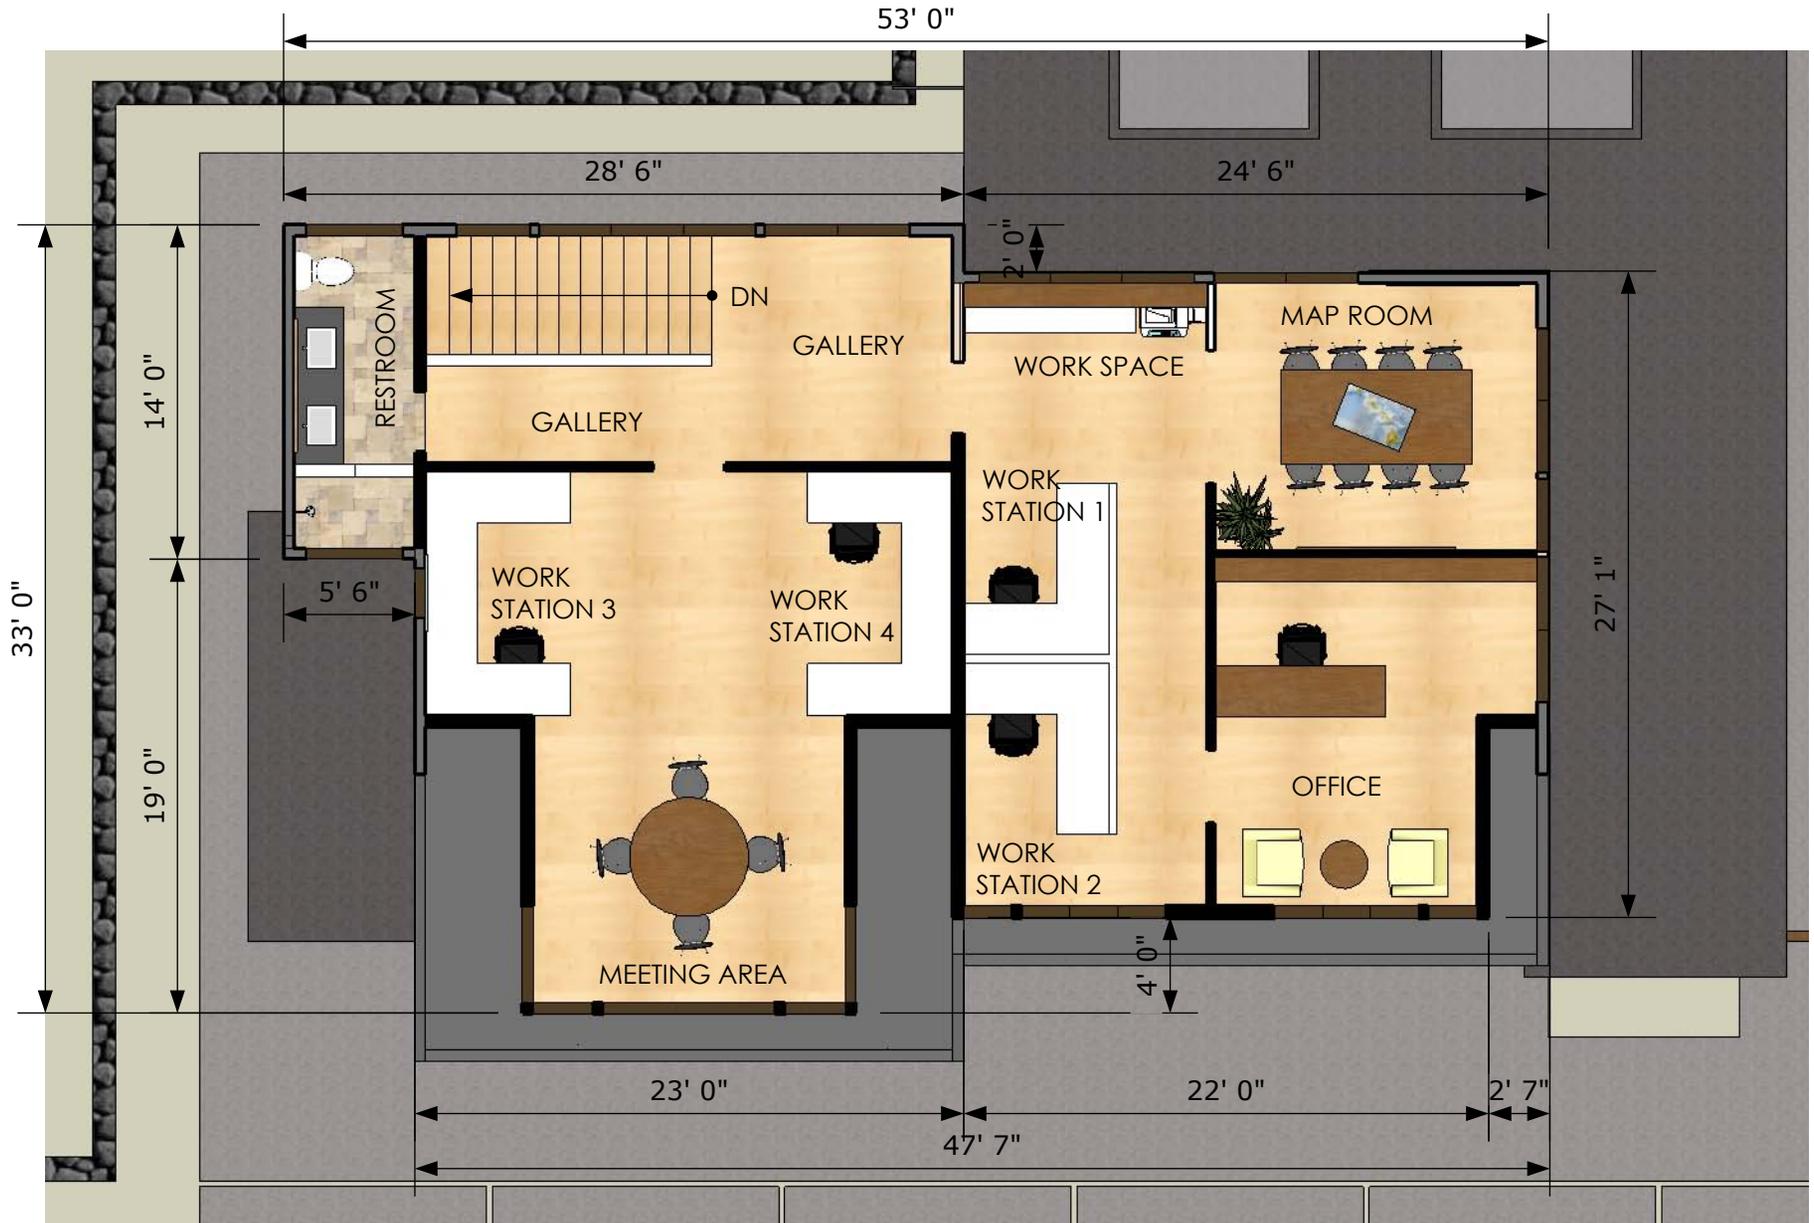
D. Office/Baseyard 2nd Floor Plan
